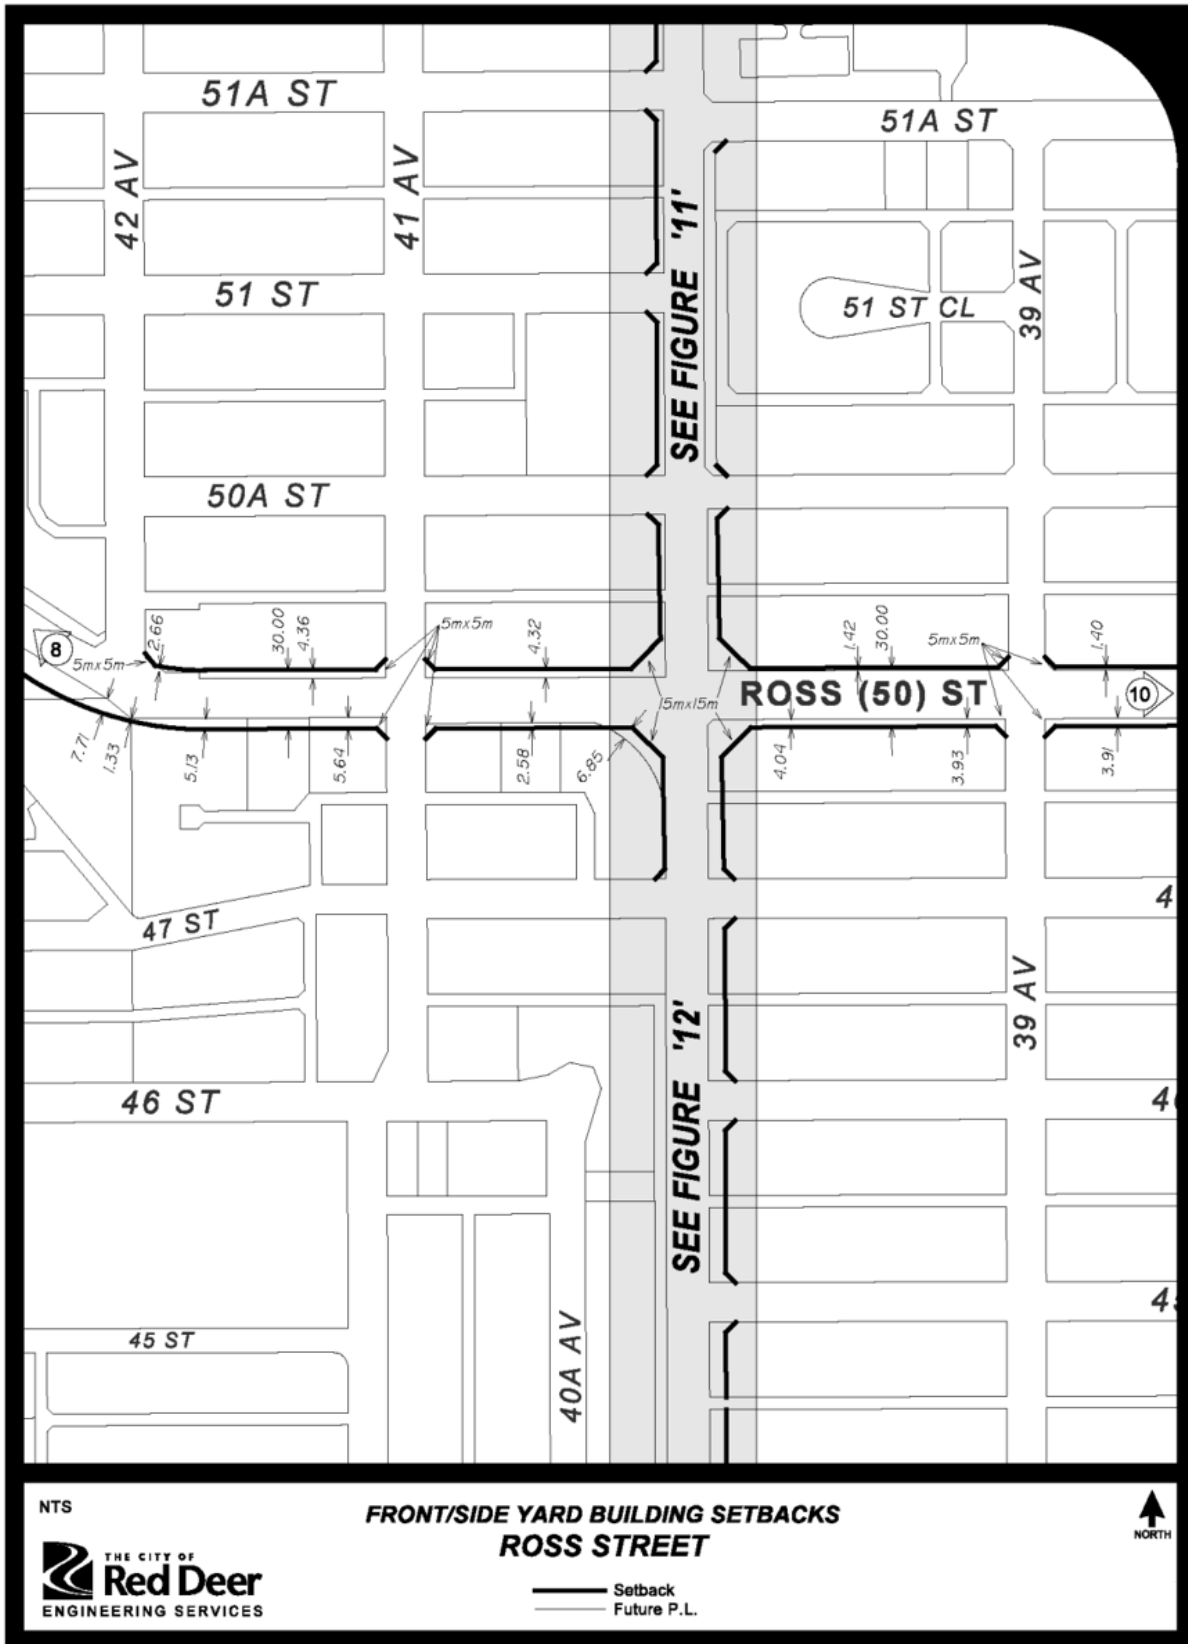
Front and Side Yard Building Setbacks - Ross St (2)
